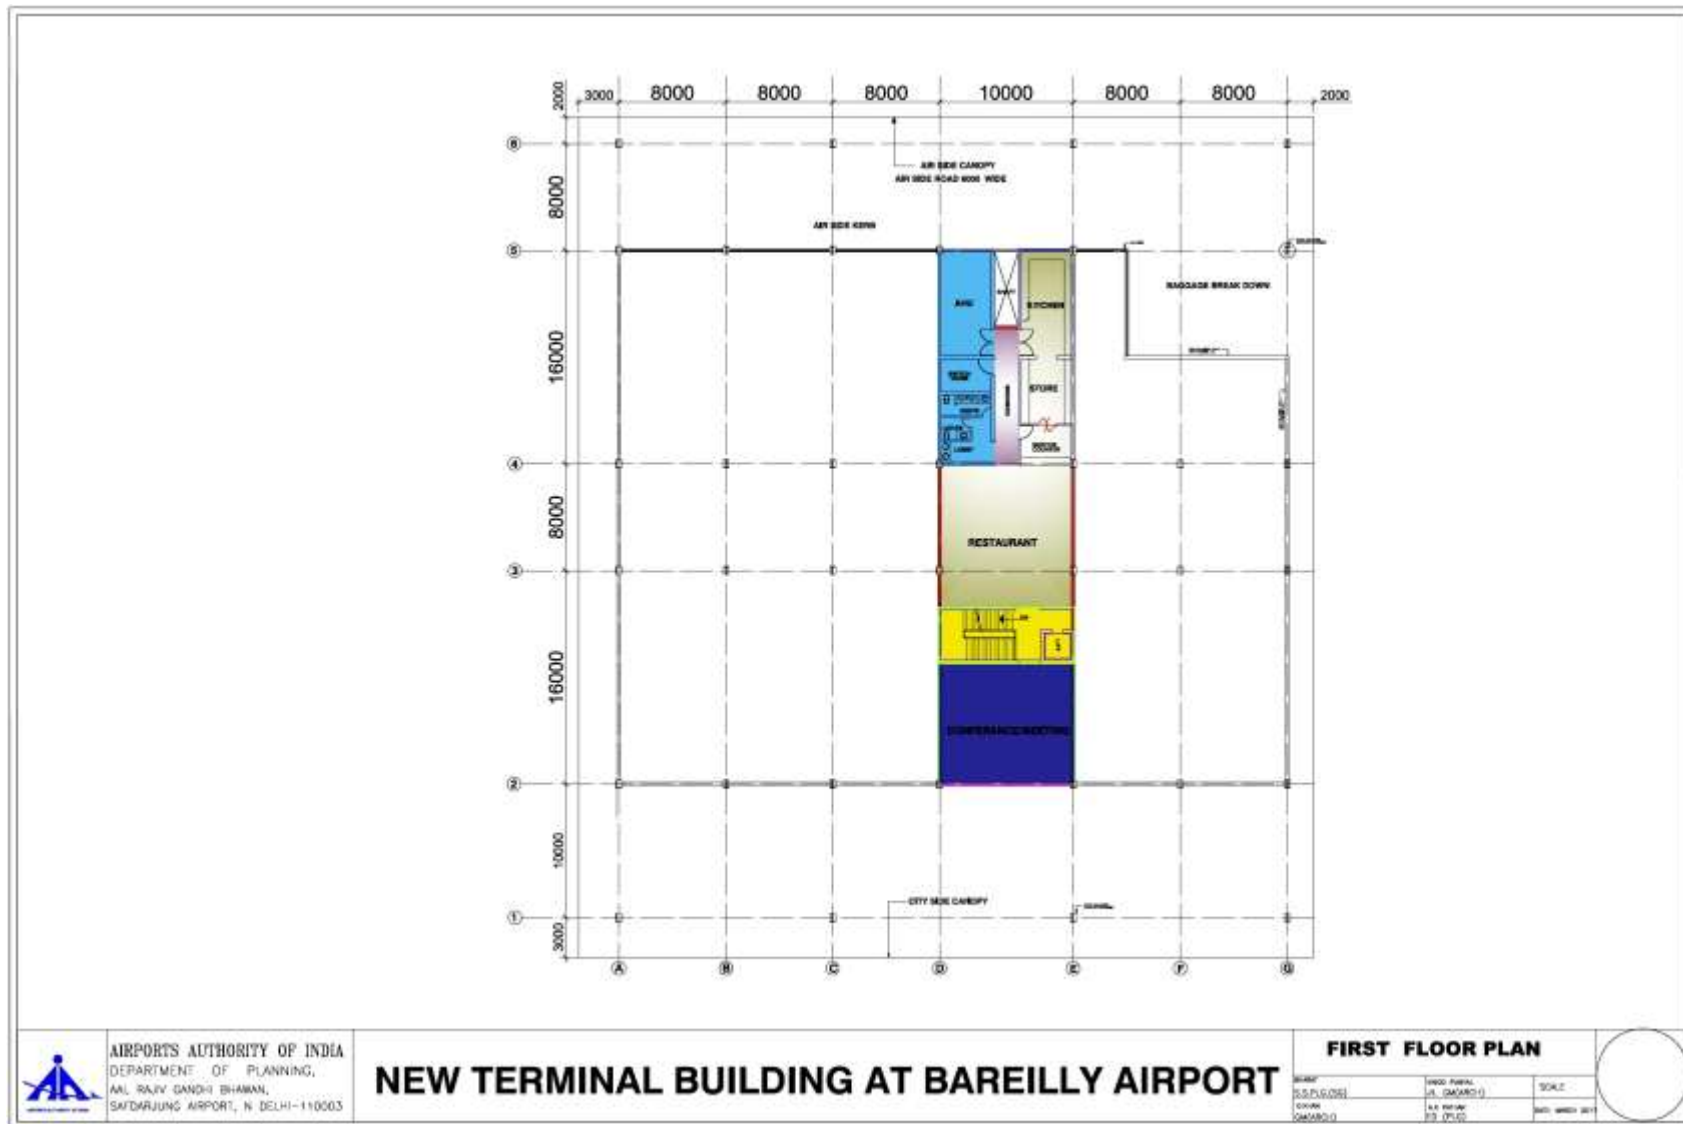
First Floor Plan for Terminal Building at Proposed New Civil Enclave at Bareilly Air Force Station
